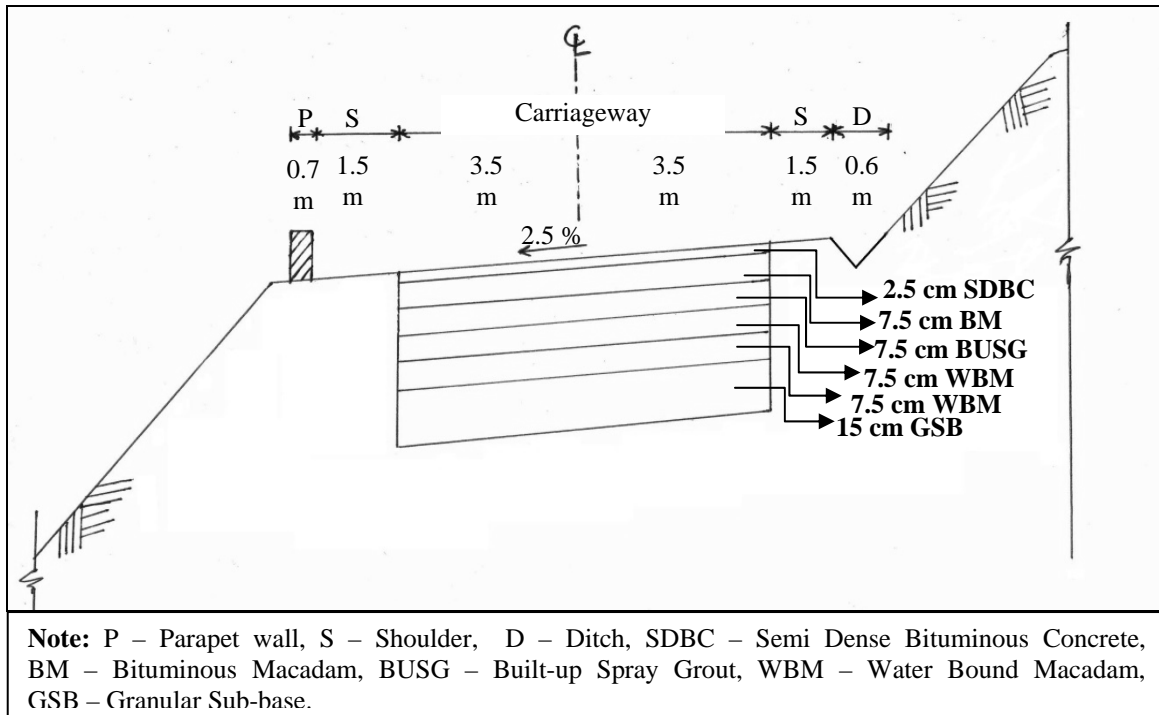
Typical Cross Section of Selected NH – 58 Sections
